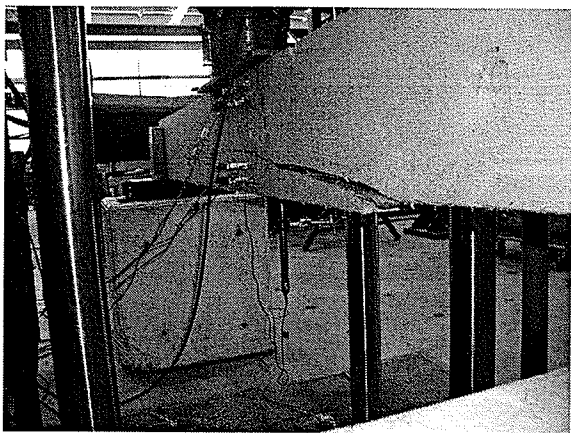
Tension Failure Originating from Drilled Hole ($C - 4$)
